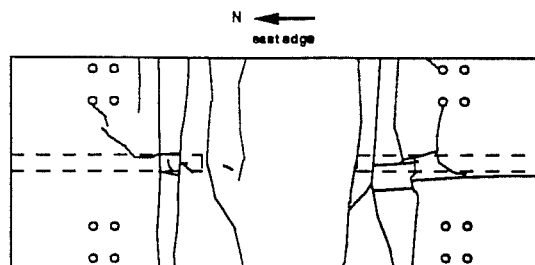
Sp. 2b: Progression of Cracking of Top Face of Roof Slab at End of Test
